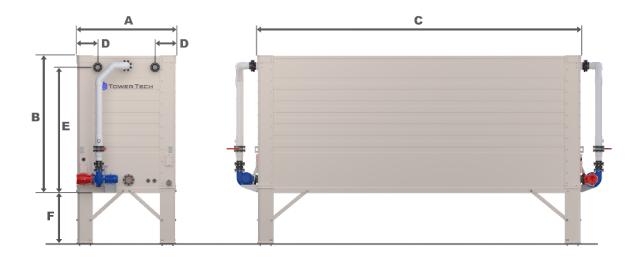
Dimensions - i1xxxx-HC & i2xxxx-HC
